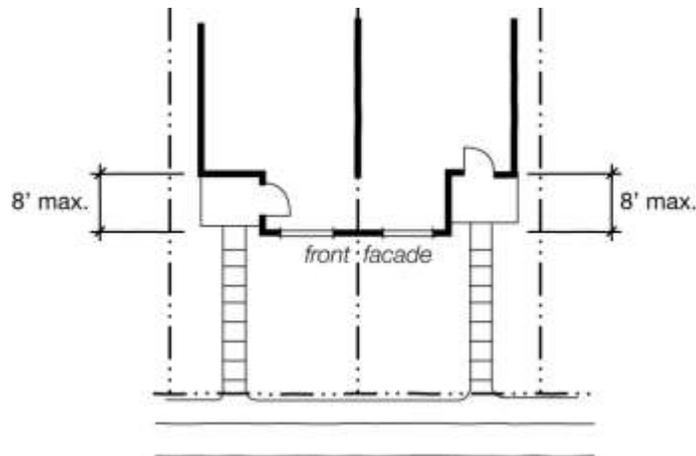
Townhouse, Building Design, Entry Treatment
